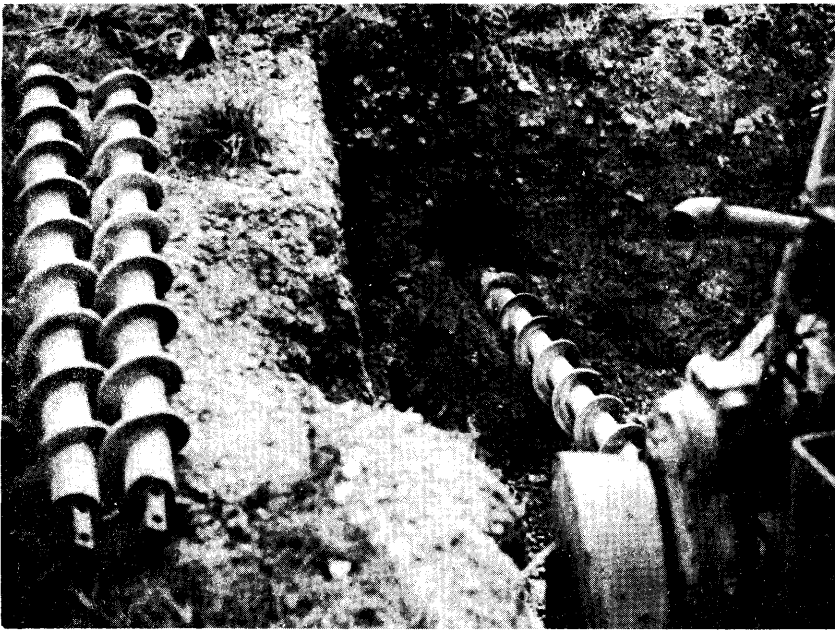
Equipment used to bore under the road and an installed pipe sleeve.
